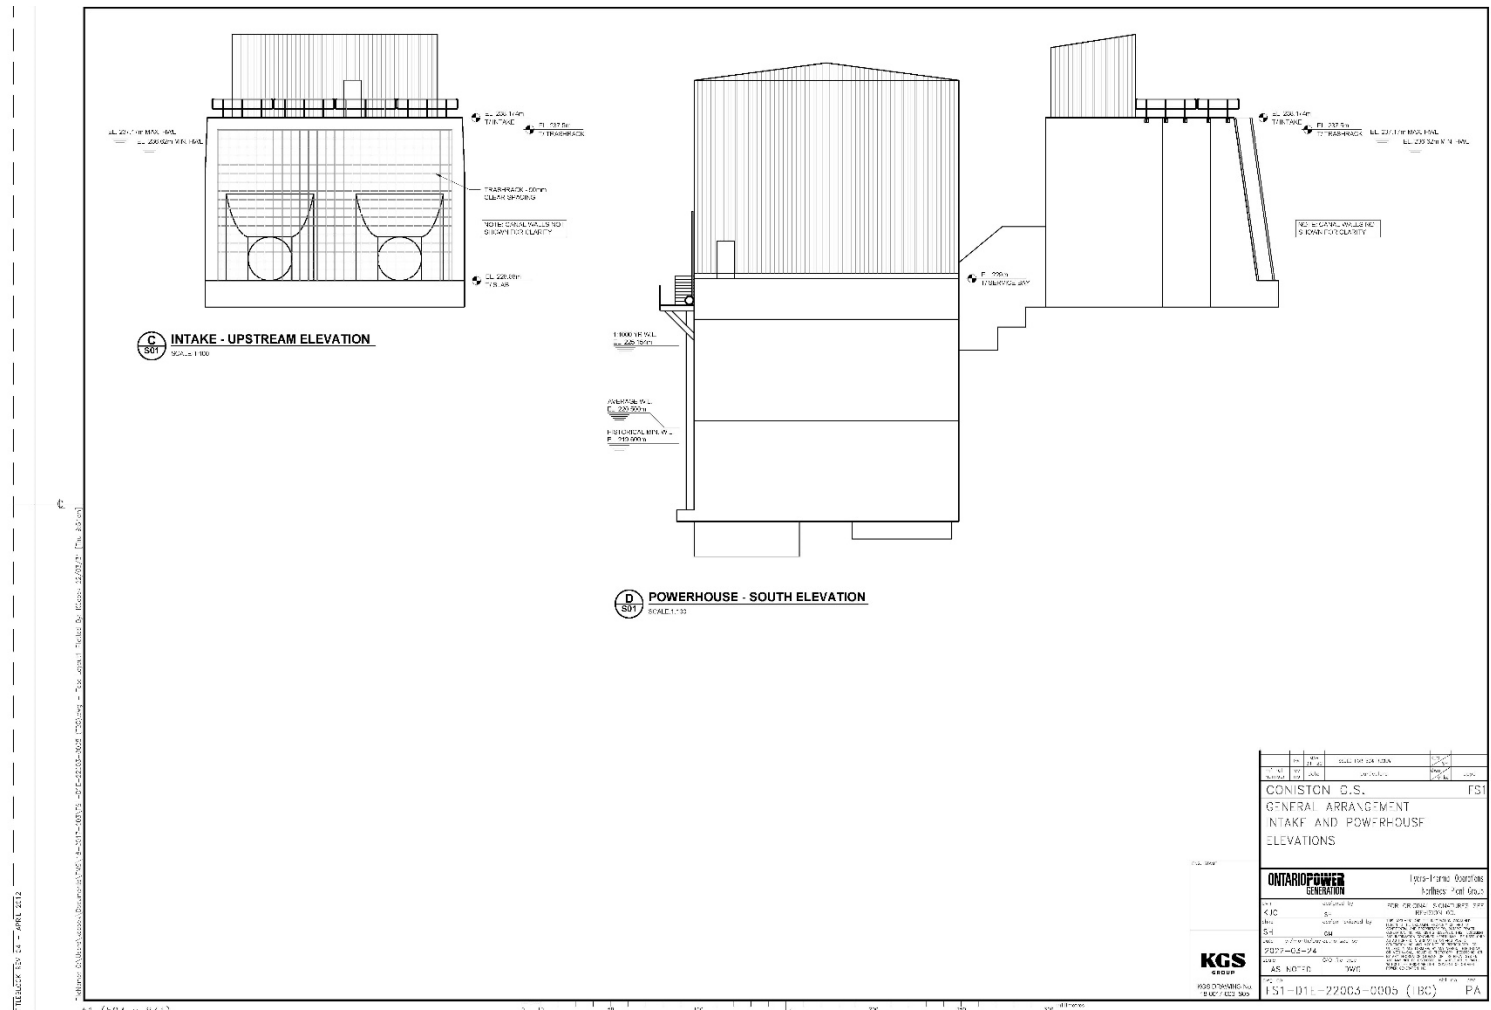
Proposed Intake and Powerhouse Various Elevations
